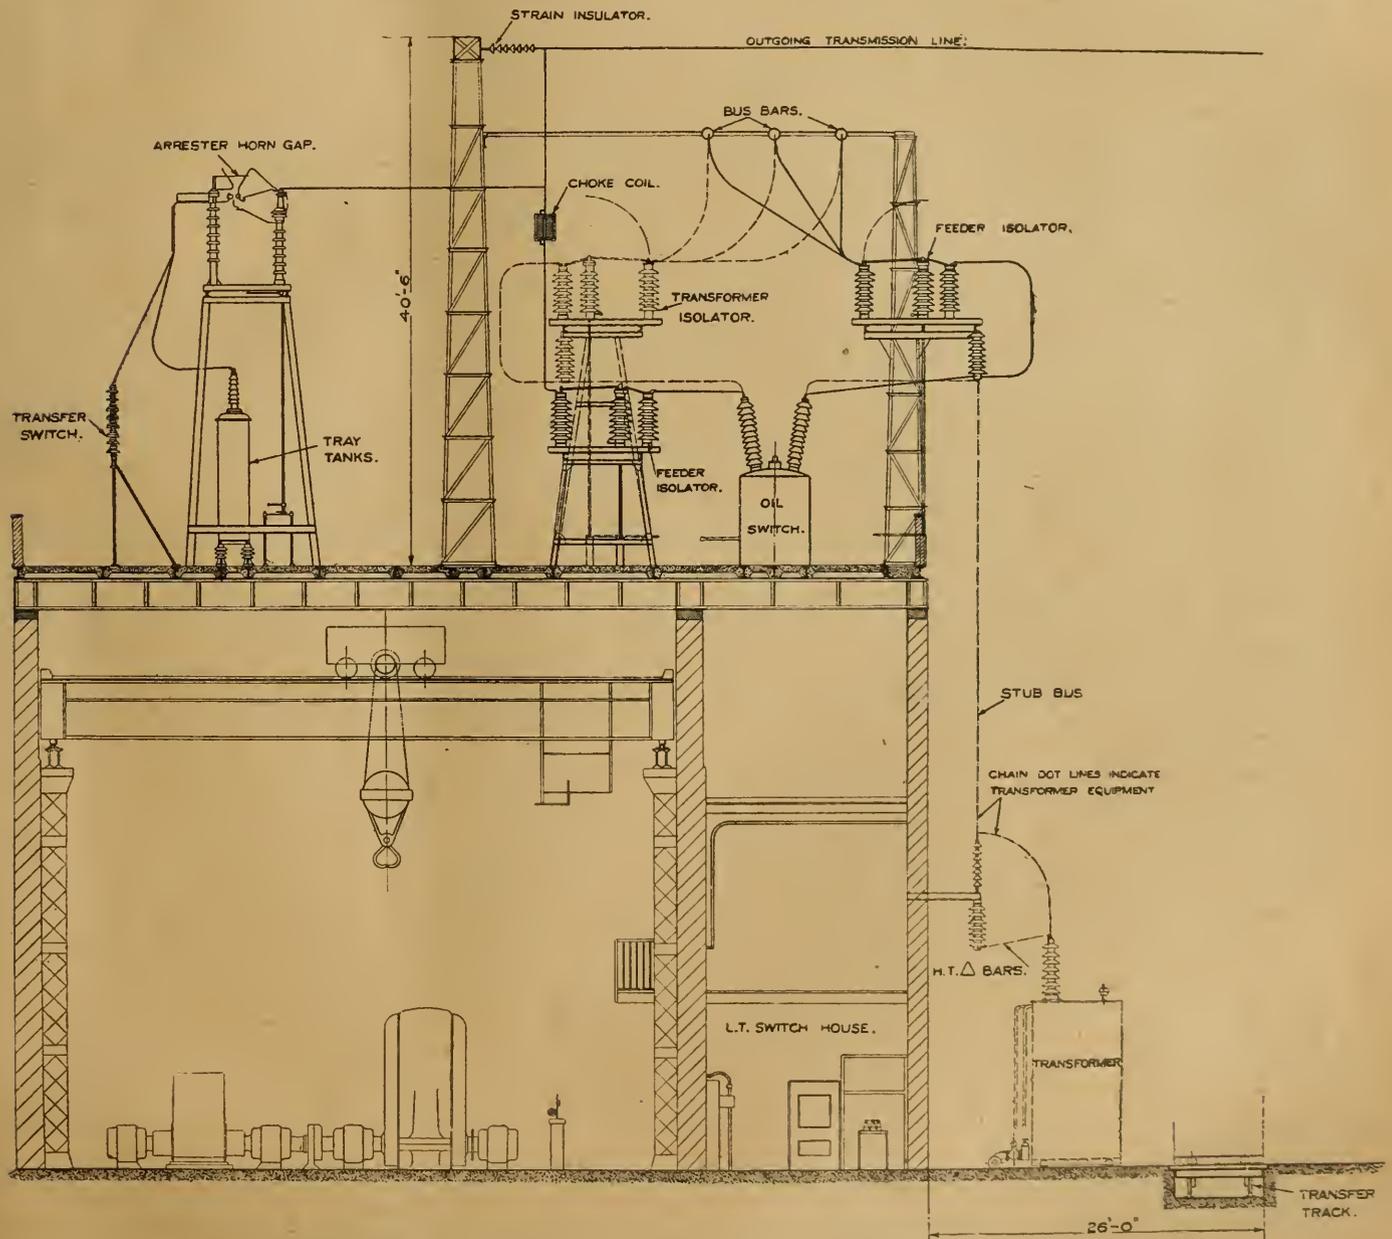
TYPICAL LAY-OUT OF 100 000 V OUTDOOR SUB-STATION. (SCHEME III.)
